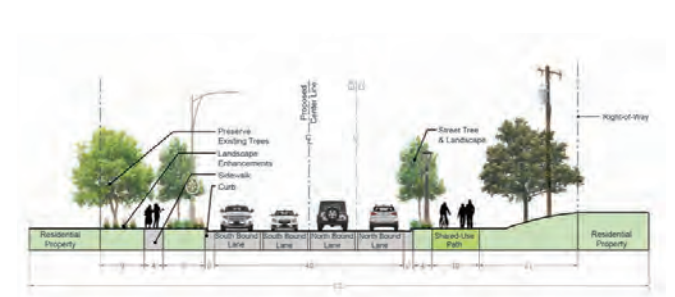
PROPOSED CONDITIONS BETWEEN NE 43RD STREET AND NE 46TH STREET
